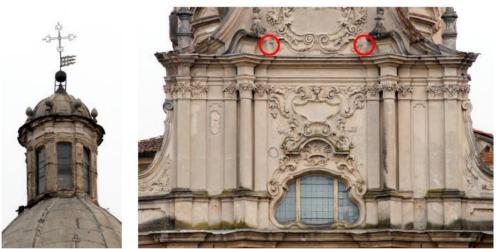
(a) The lantern (b) The jut of the façade and the instrumented locations.
